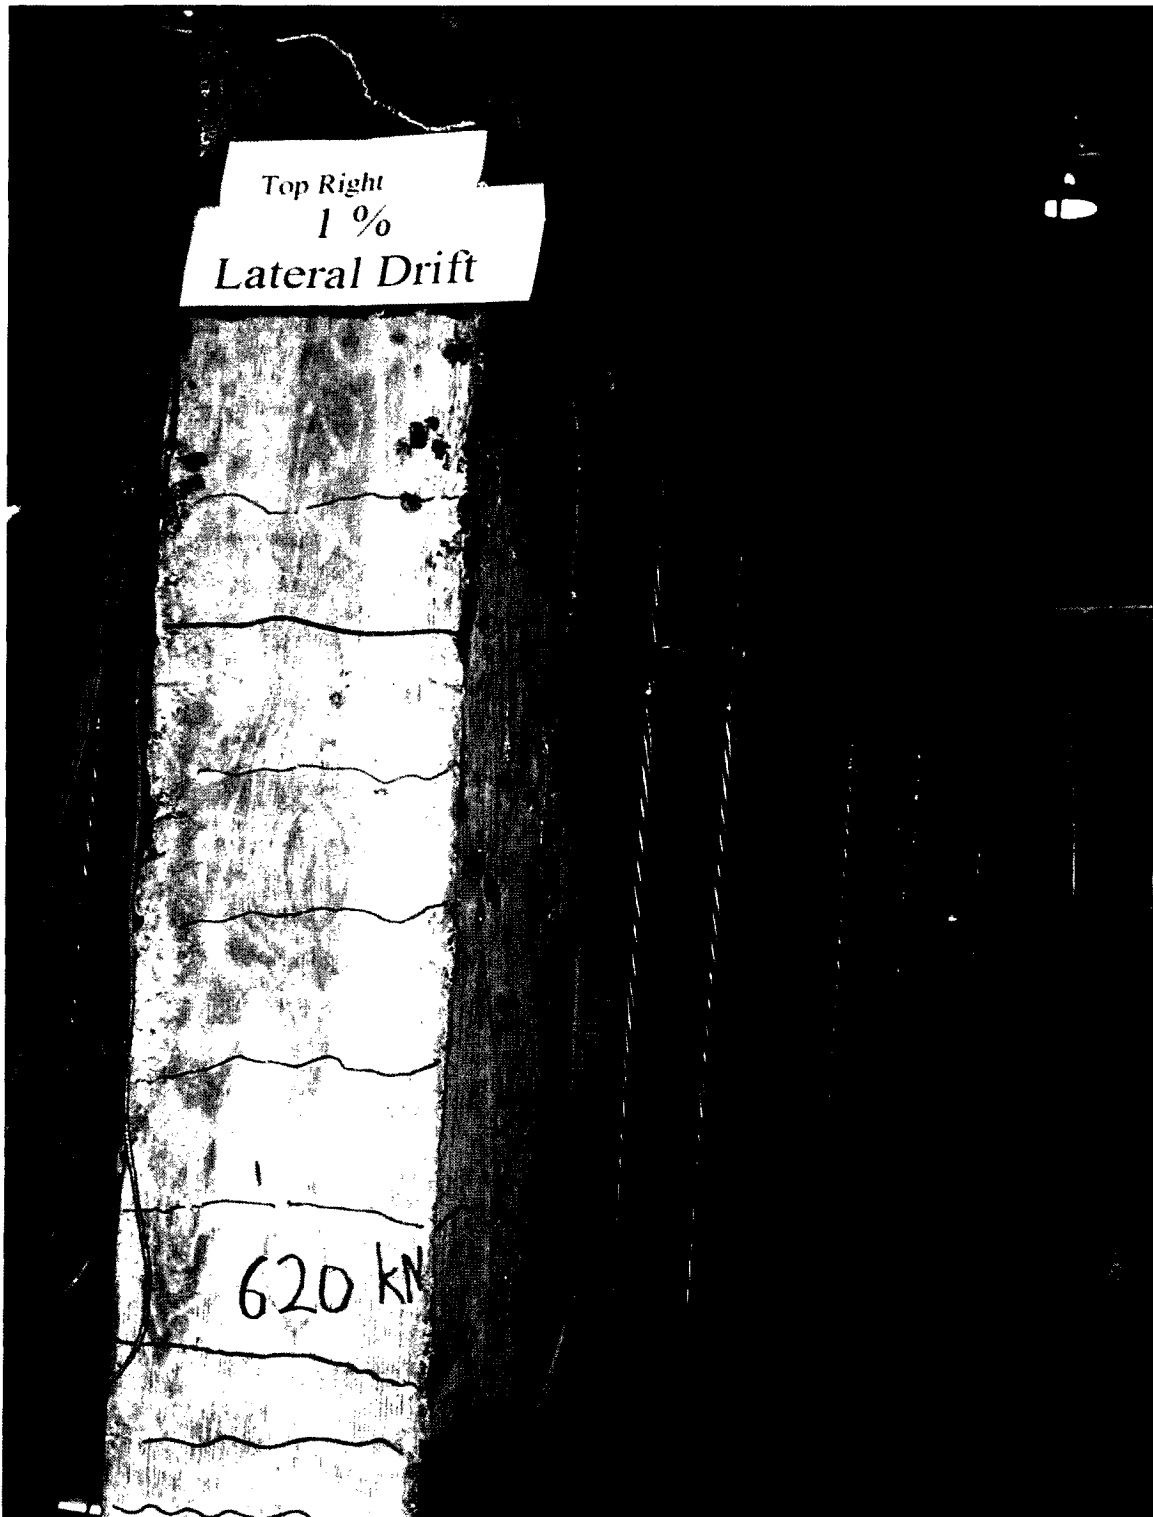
Additional horizontal cracks in column at 1.0 % lateral drift (BL-3)
